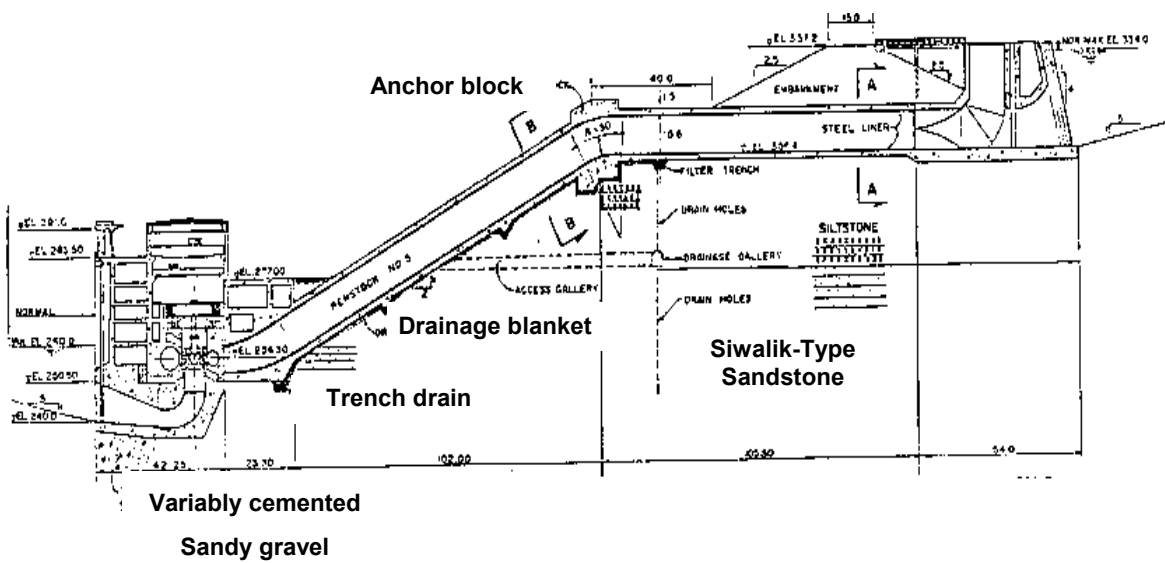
Ghazi-Barotha Powerhouse Cross Section
